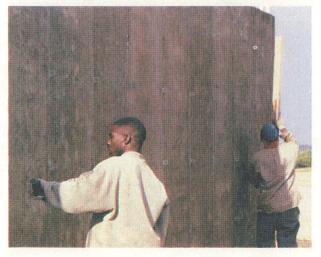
Wall ties snap on impact; those out of easy hammer reach fall to a length of 2x4. The forming crew leaves the slab broomclean for the framers.
